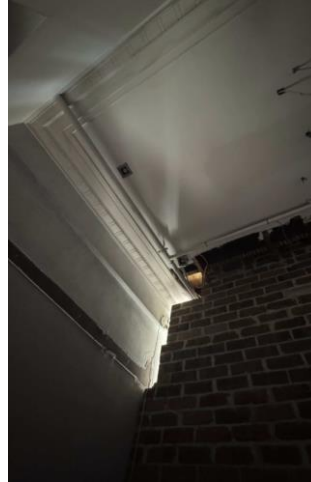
View of the central terrace, central room with pipe run penetrating through a face brick wall. Source: Trethowan Heritage, 2026.
